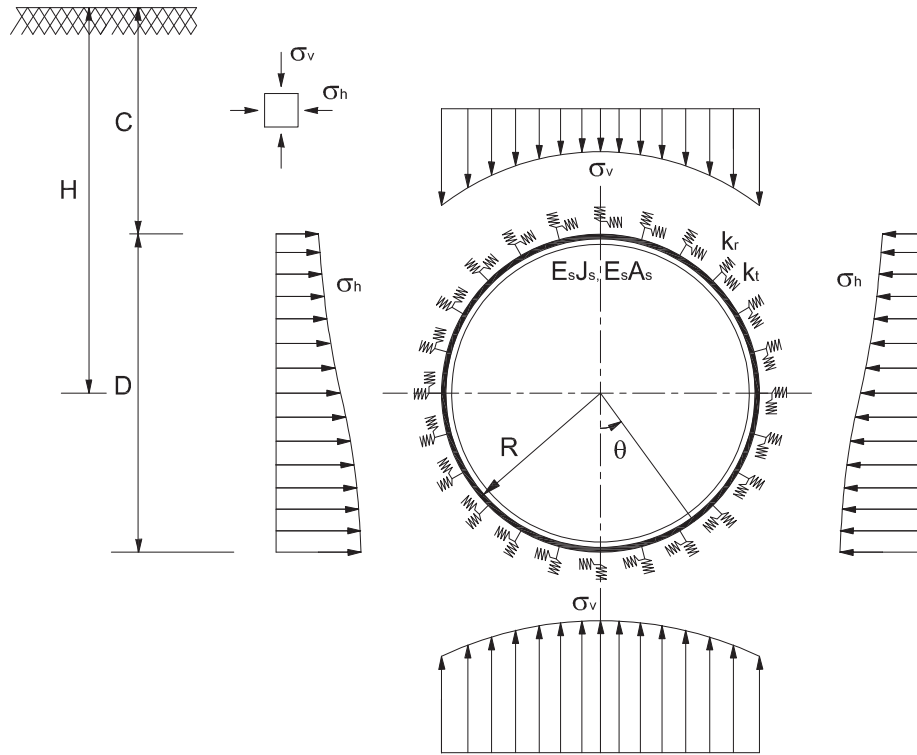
Structural design model for tunnels in the long-term (Vu et al., 2017).
